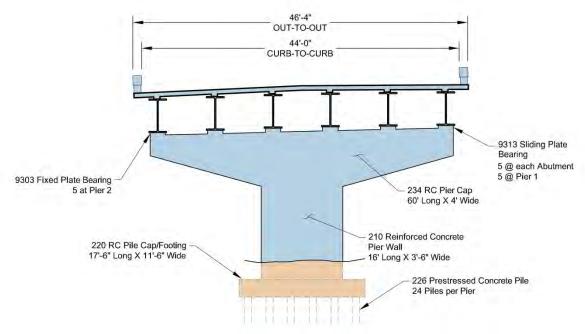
EI.24.9- 3: Cross section view of superstructure of continuous steel girder bridge
